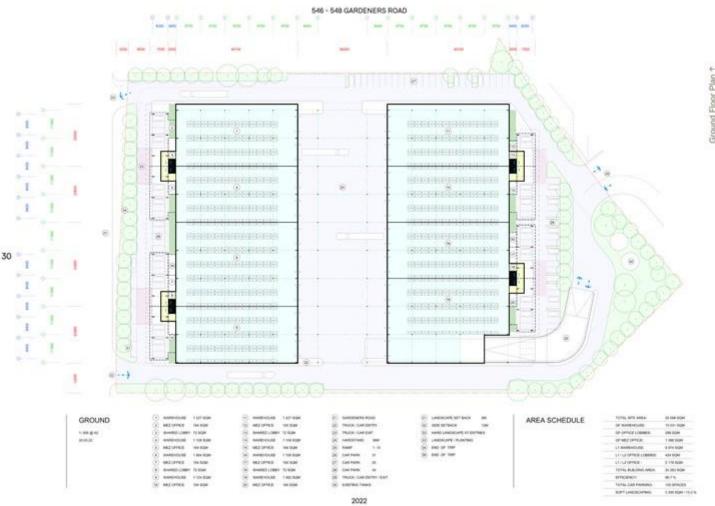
Conceptual Ground Floor Layout (Source: design+)
